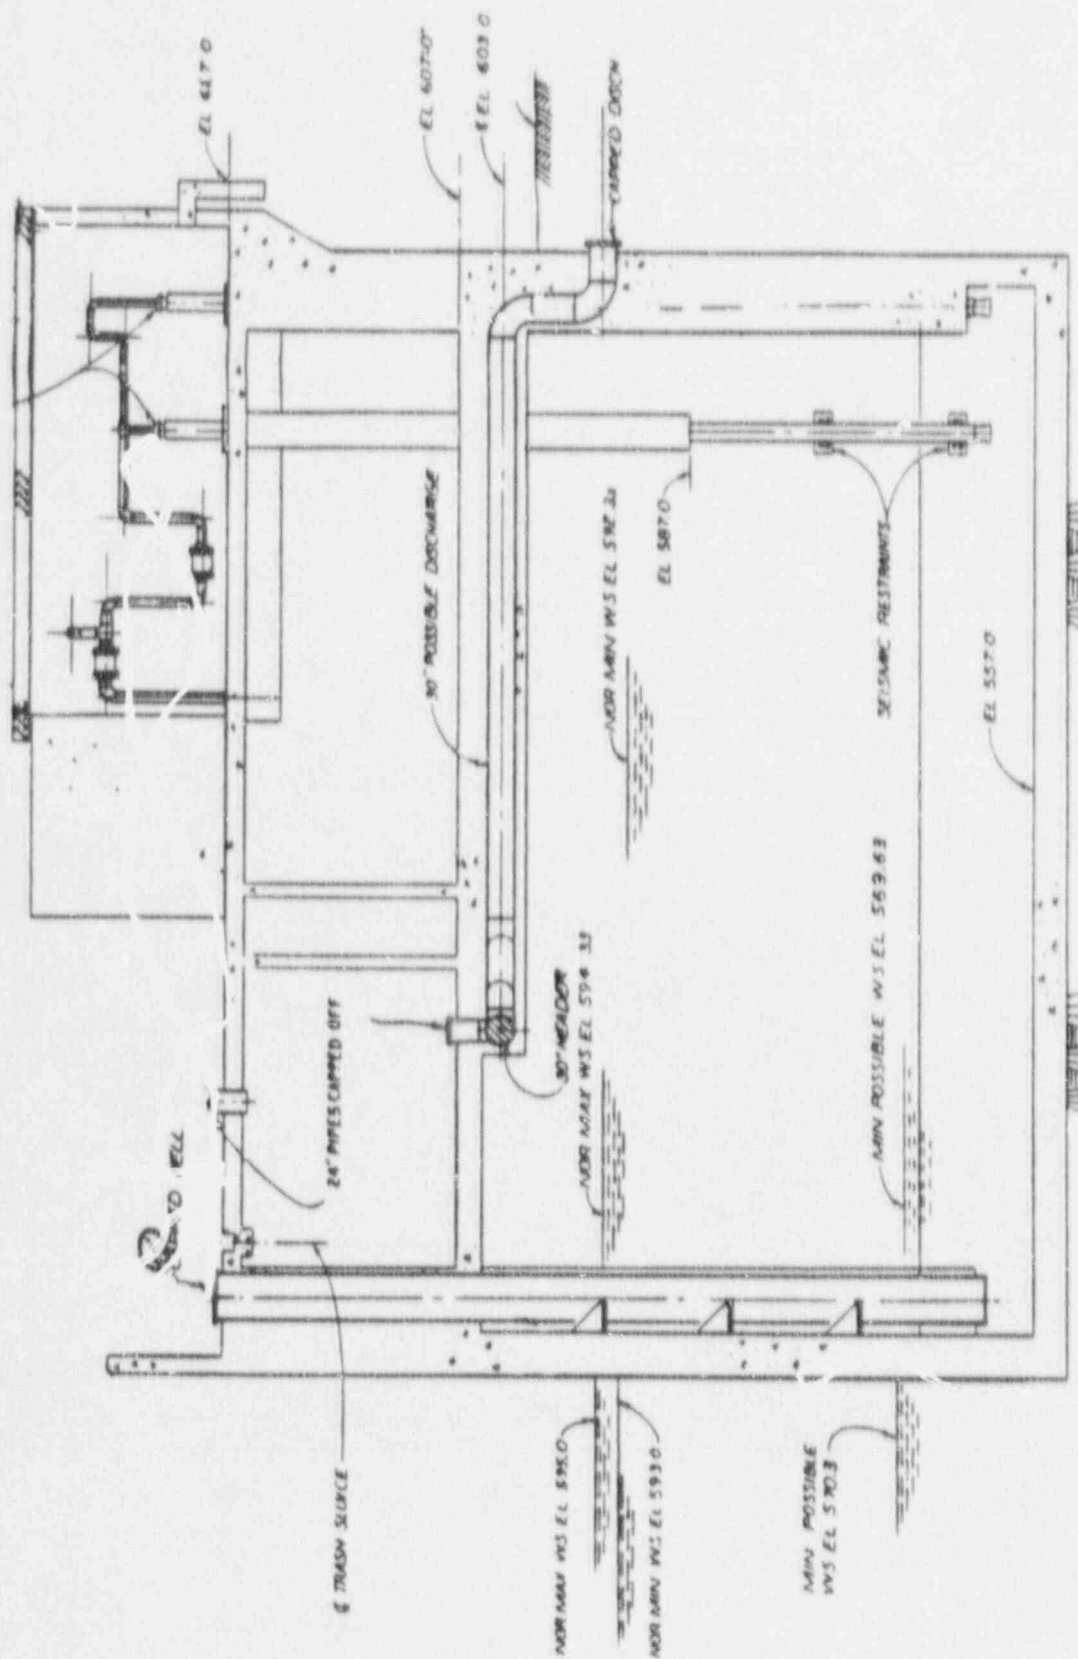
Elevation Views of the Bellefonte Intake Pumping Station (Sheet 1 of 2)
